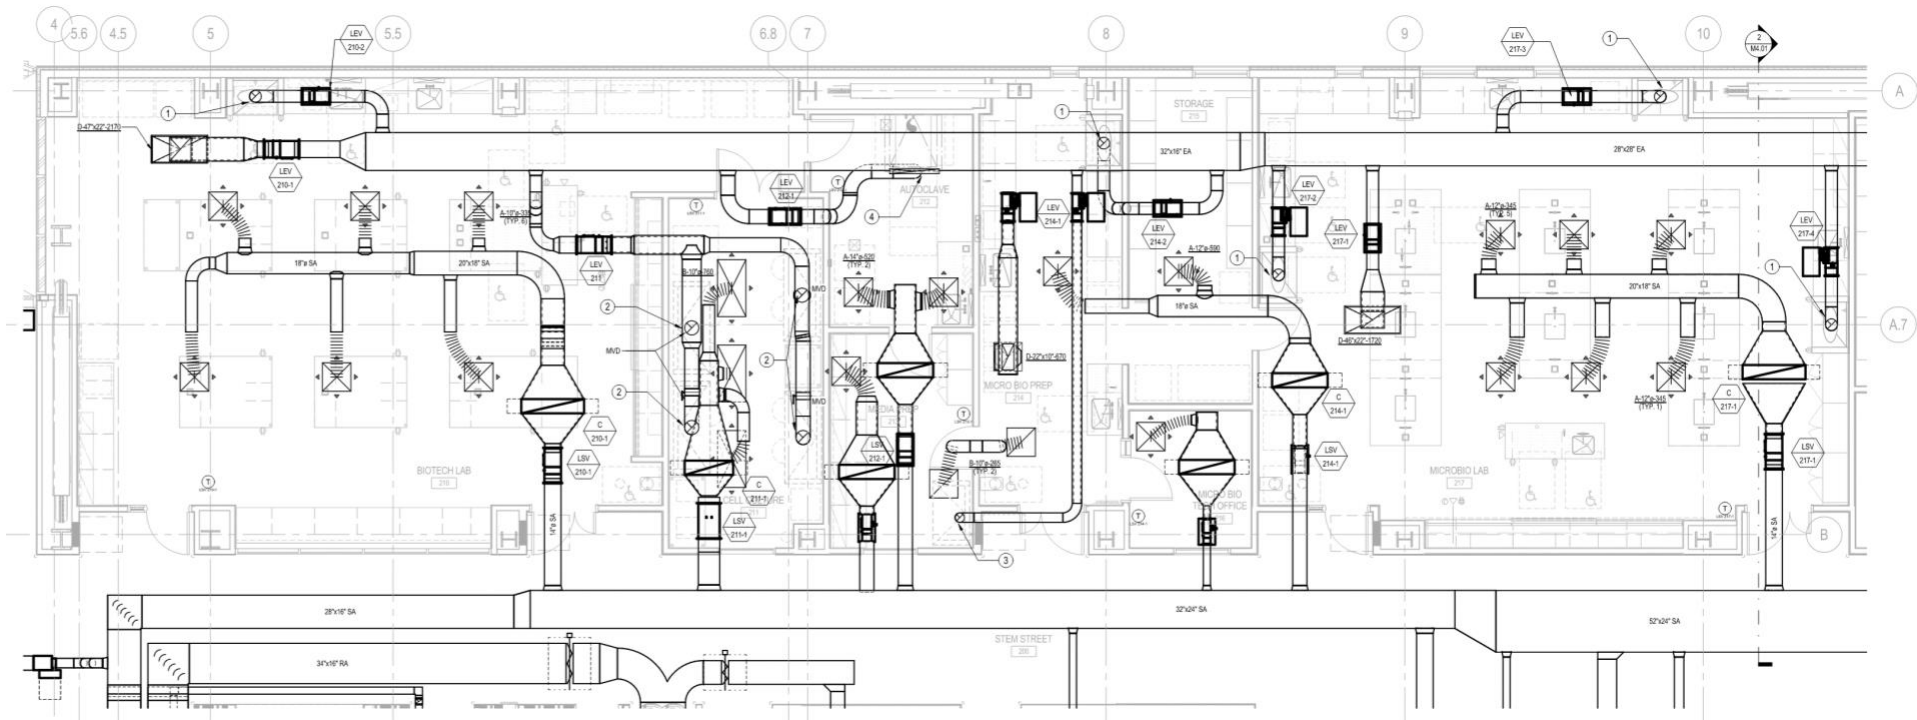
Typical 4-Pipe VAV lab ductwork plan.
